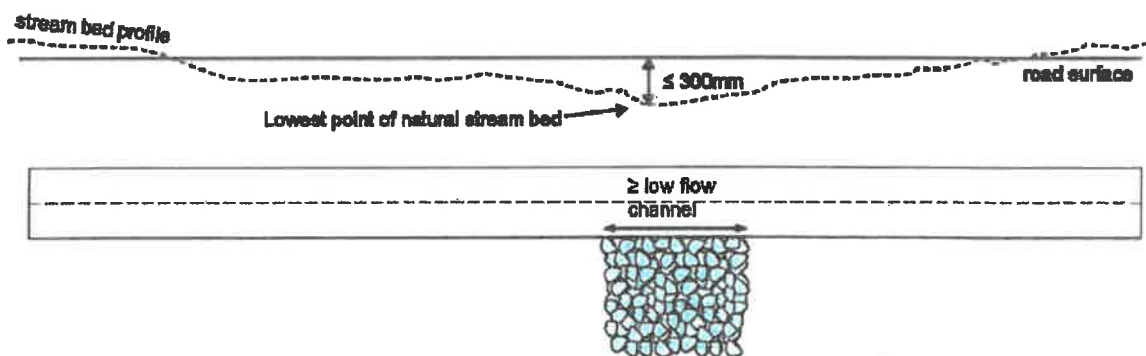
Green option two (no low flow section incorporated)—cross section and plan view
